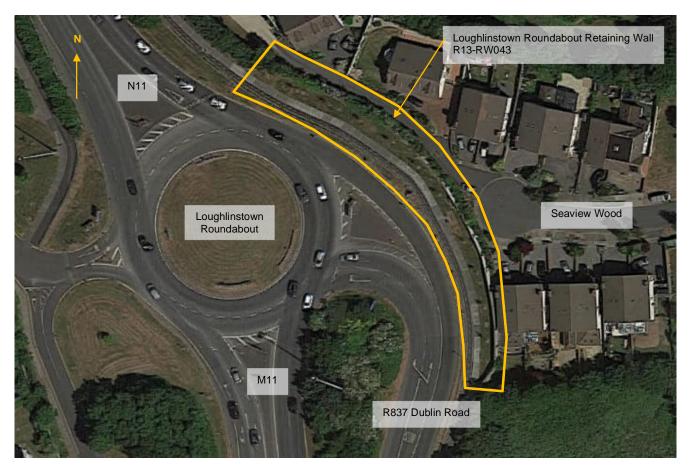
Plan view of Loughlinstown Roundabout Retaining Wall and surrounding features
